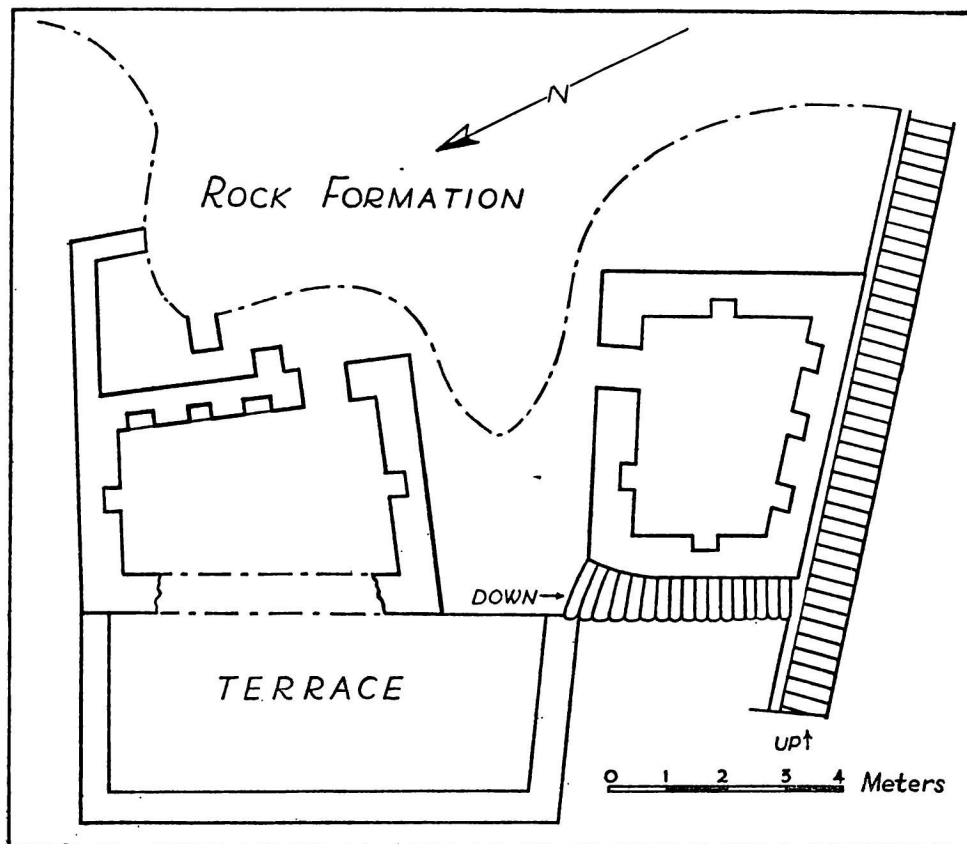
PLAN OF HOUSE GROUP 4 AT PHUYU PATA MARKA
